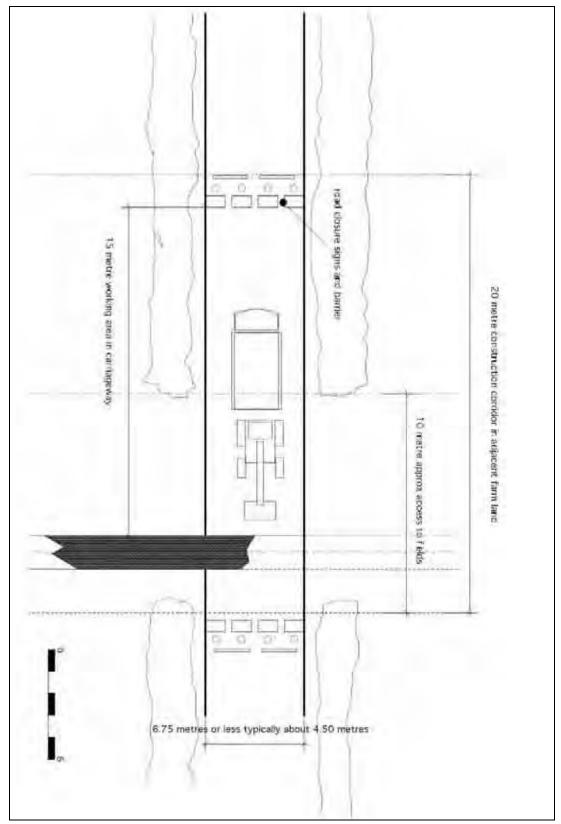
Illustrative arrangement of typical traffic management and working trench
